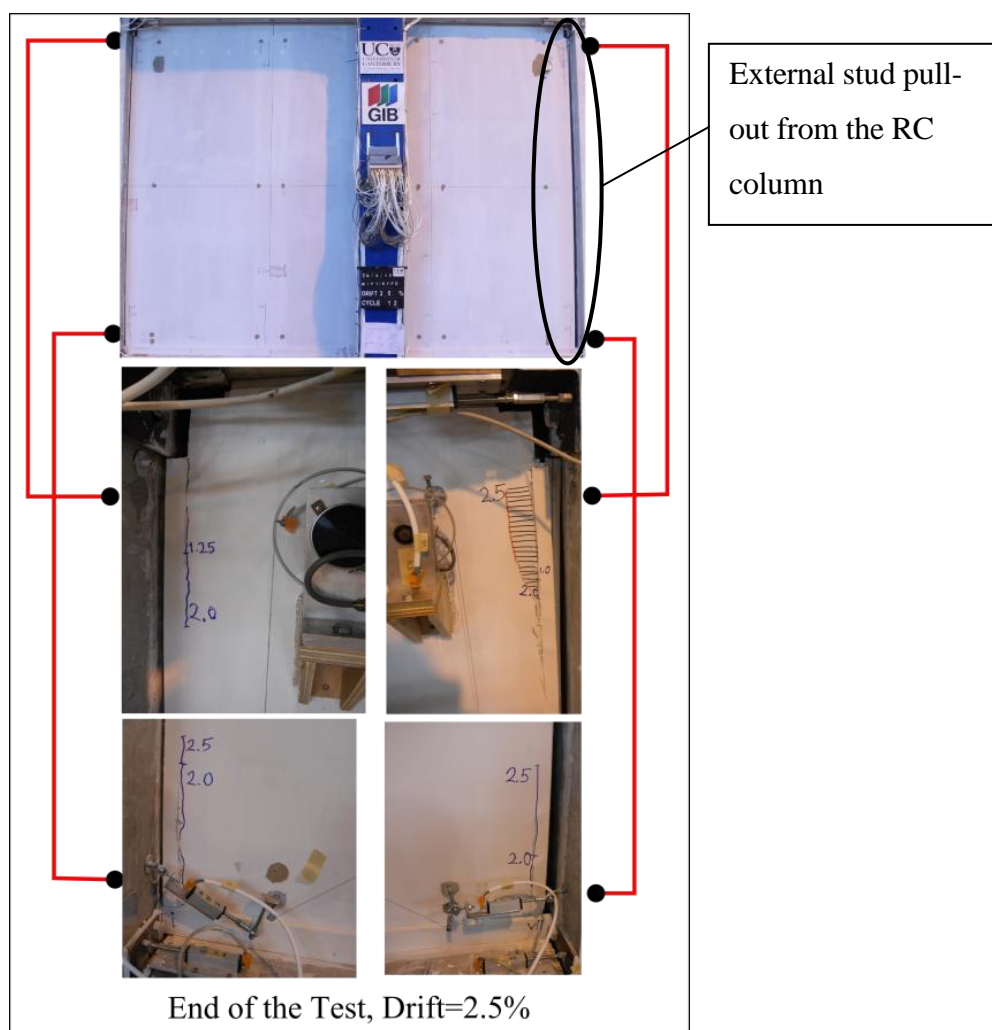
Drift based damage at the end of test of low damage steel framed drywall MIF1-STFD
